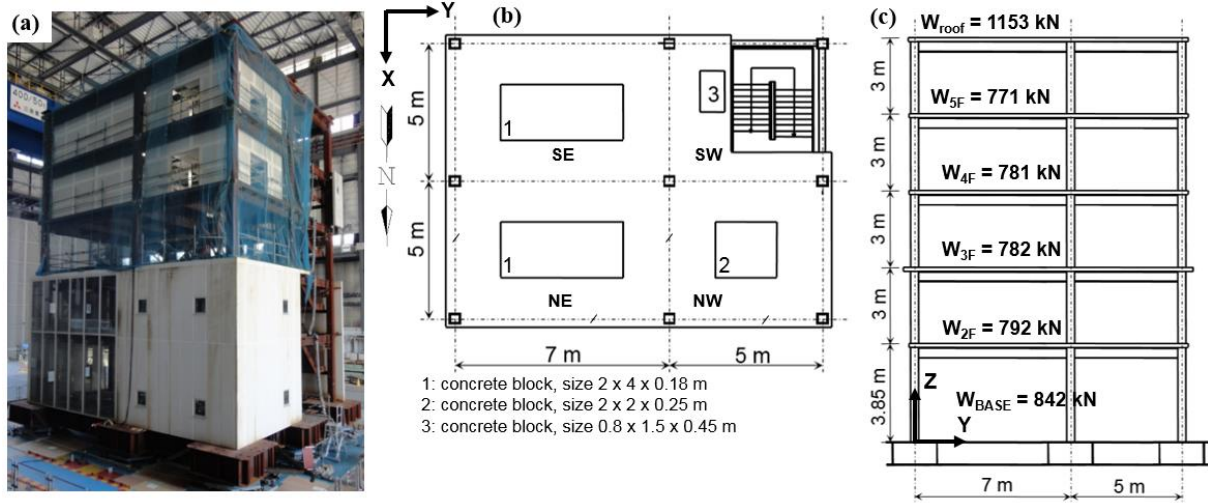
Test building (a) photo, (b) typical floor plan, and (c) elevation view with total weight per floor
